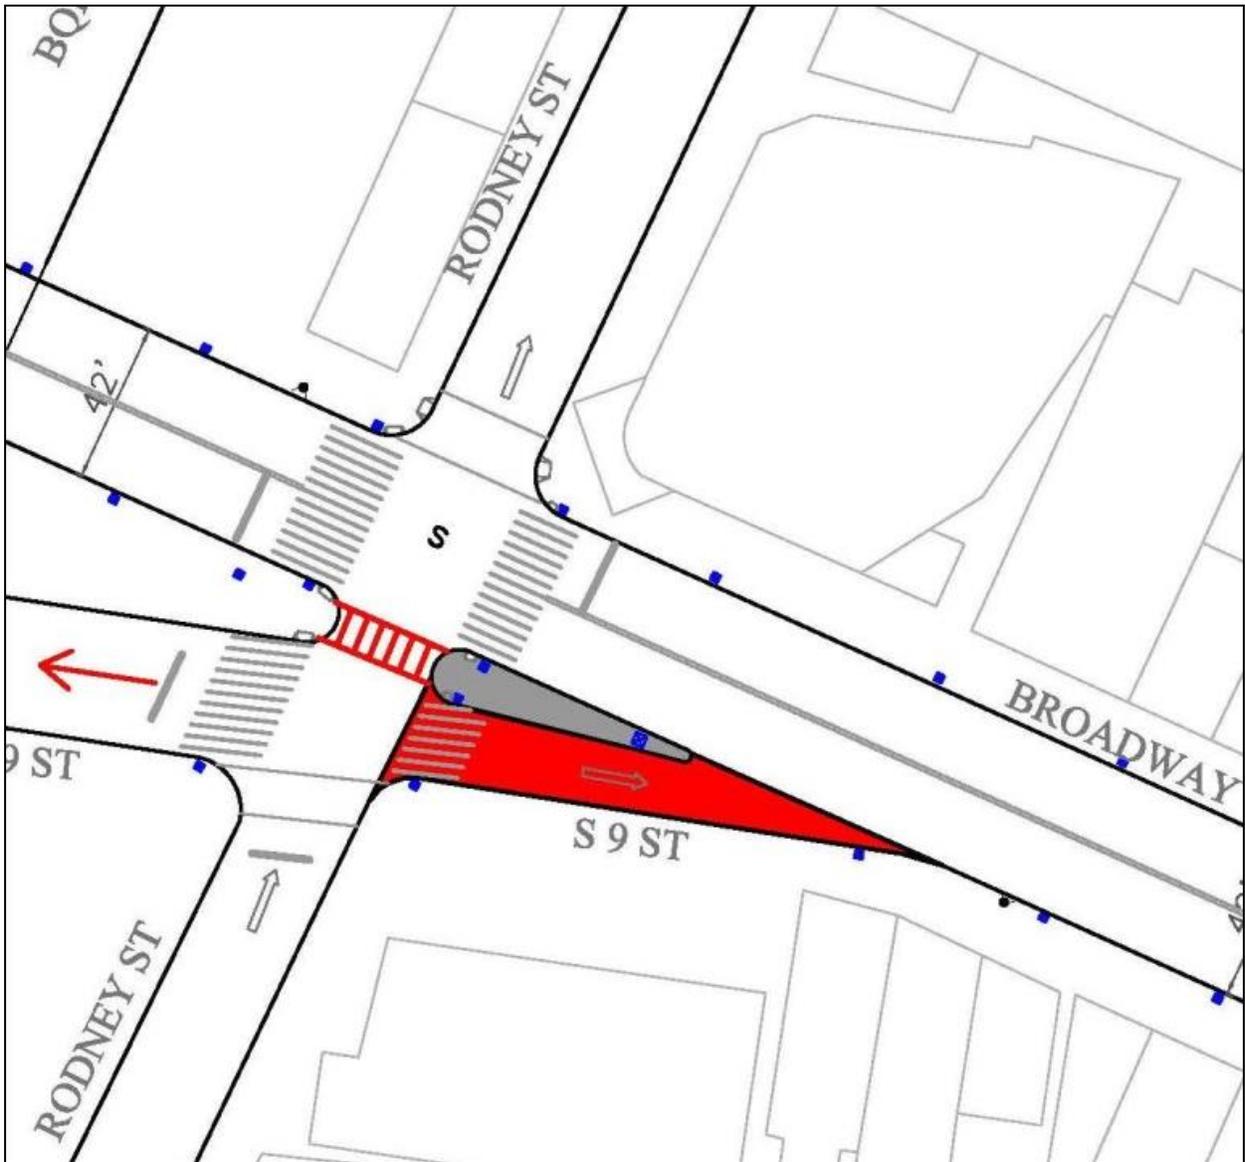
Broadway, Rodney Street and South 9th Street Proposed Improvement
